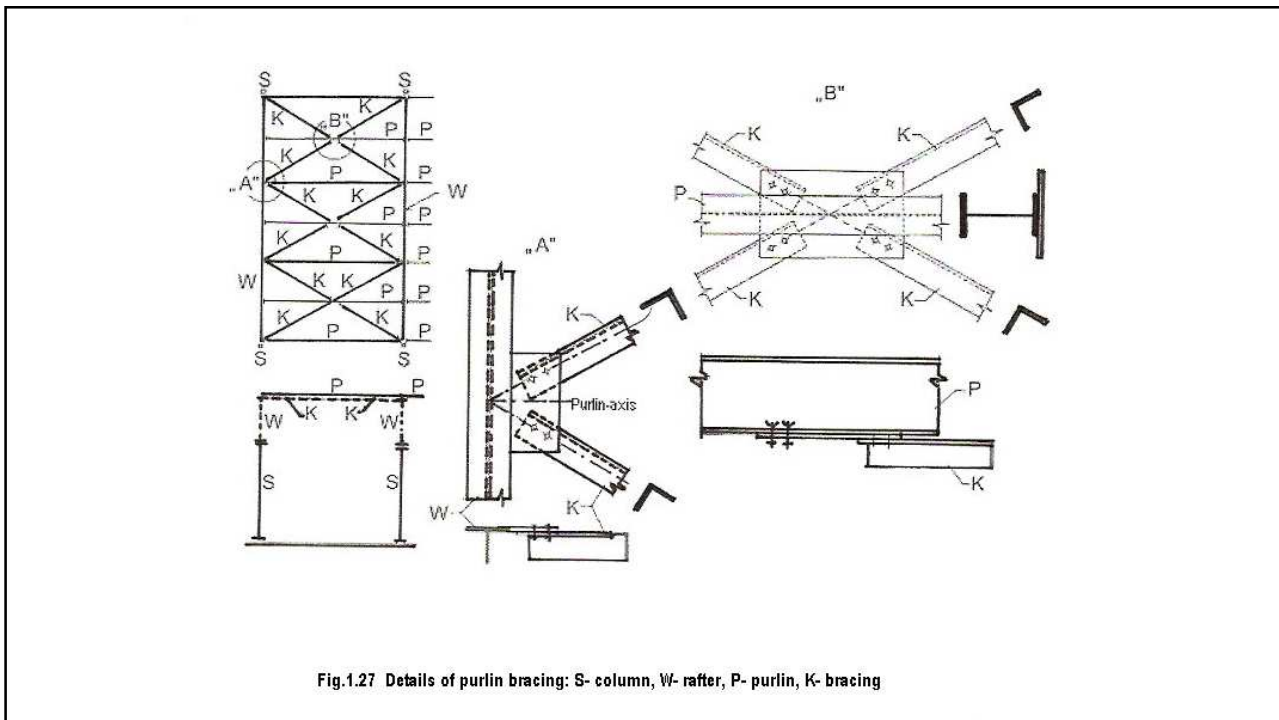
Details of purlin bracing: S- column, W- rafter, P- purlin, K- bracing
